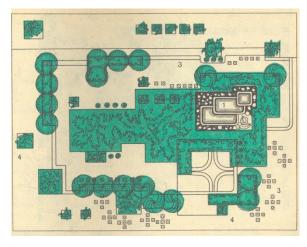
Roof garden of an administrative building in Sulbach (Germany)
